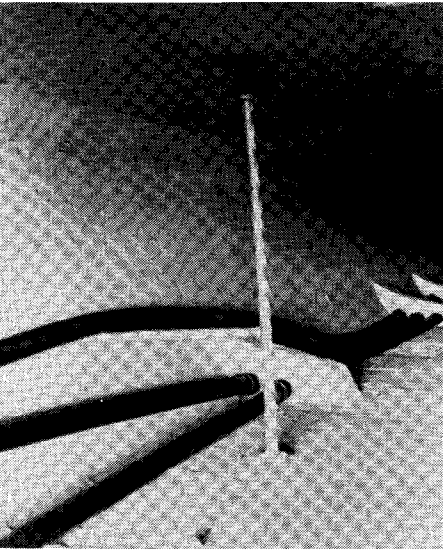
Longitudinal tendons within box girder cells, Keys Bridges, Florida.
